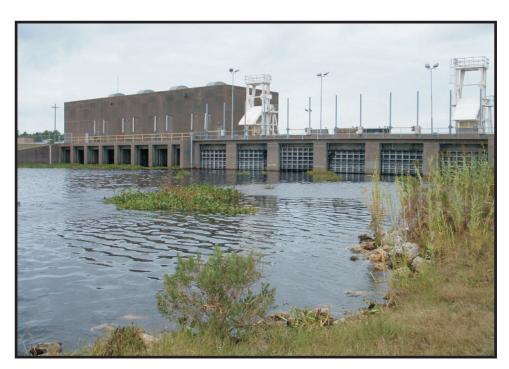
View from east bank of Alligator Bayou of output side of PS 16, facing northwest
